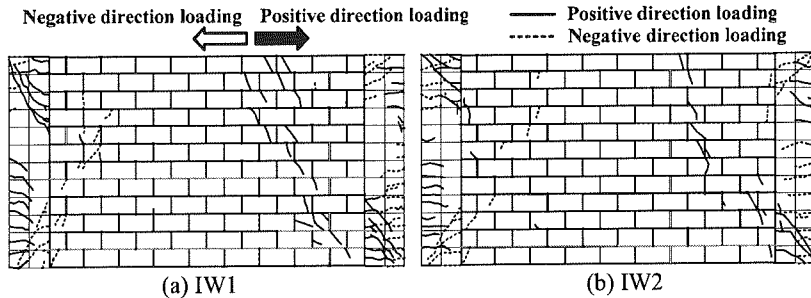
Cracks in RC columns and CB walls at the first cycle with peak drift angle of 1.0%
